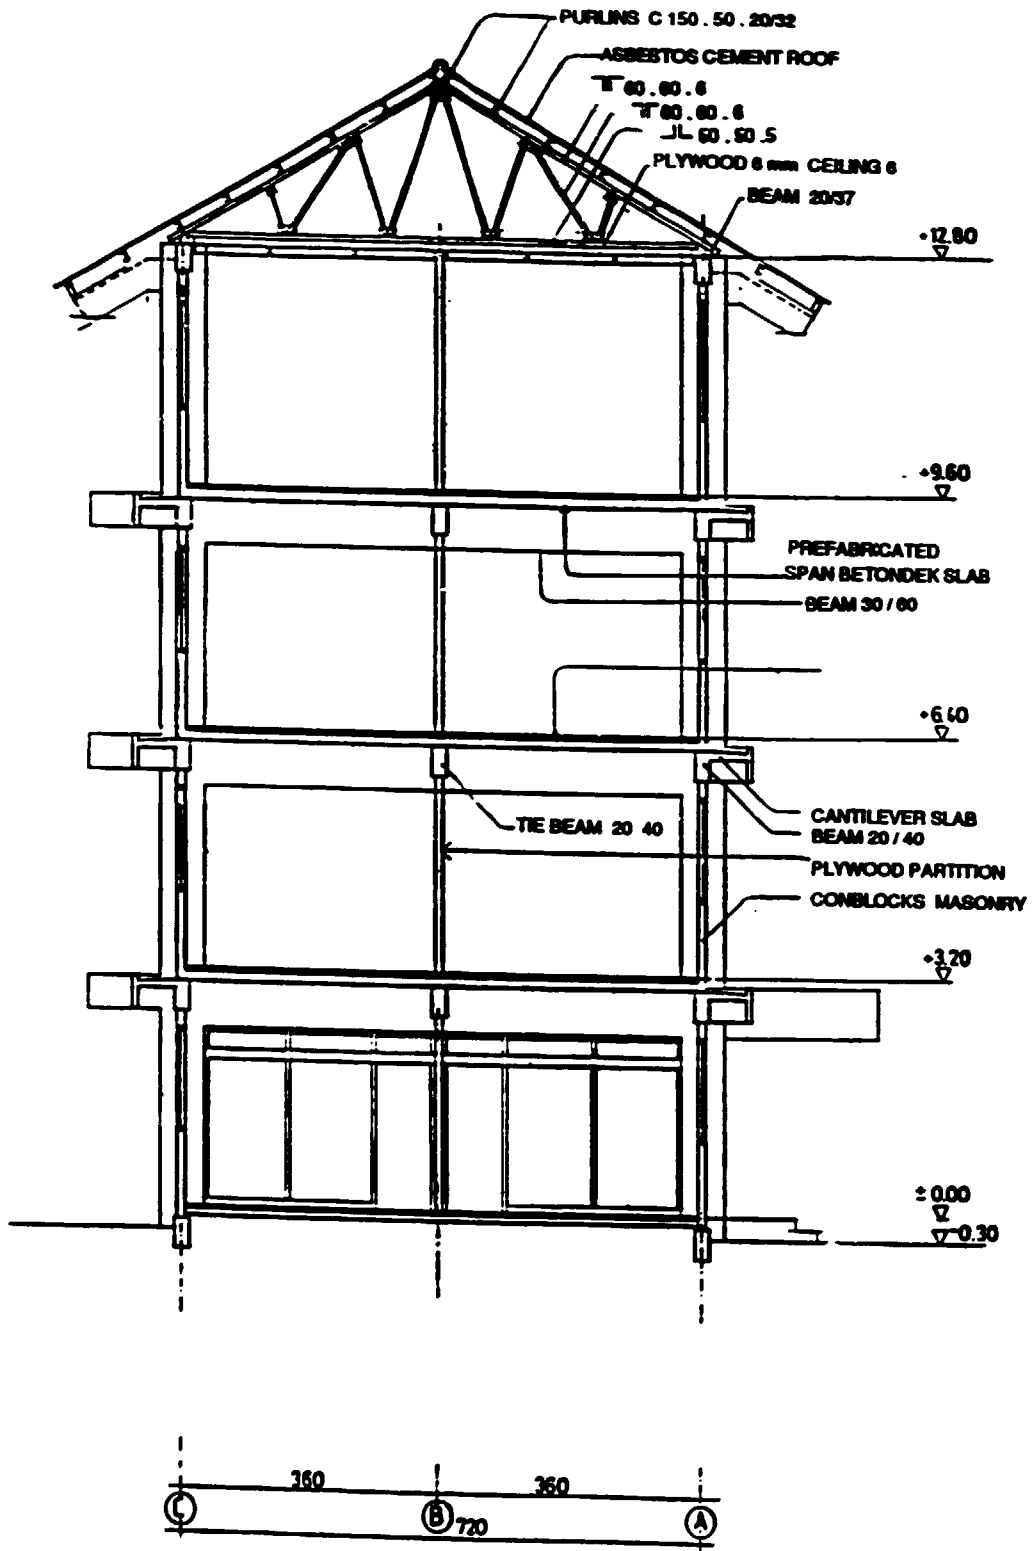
Vertical section, showing structural elements, near end of building. Section parallel to short side.
